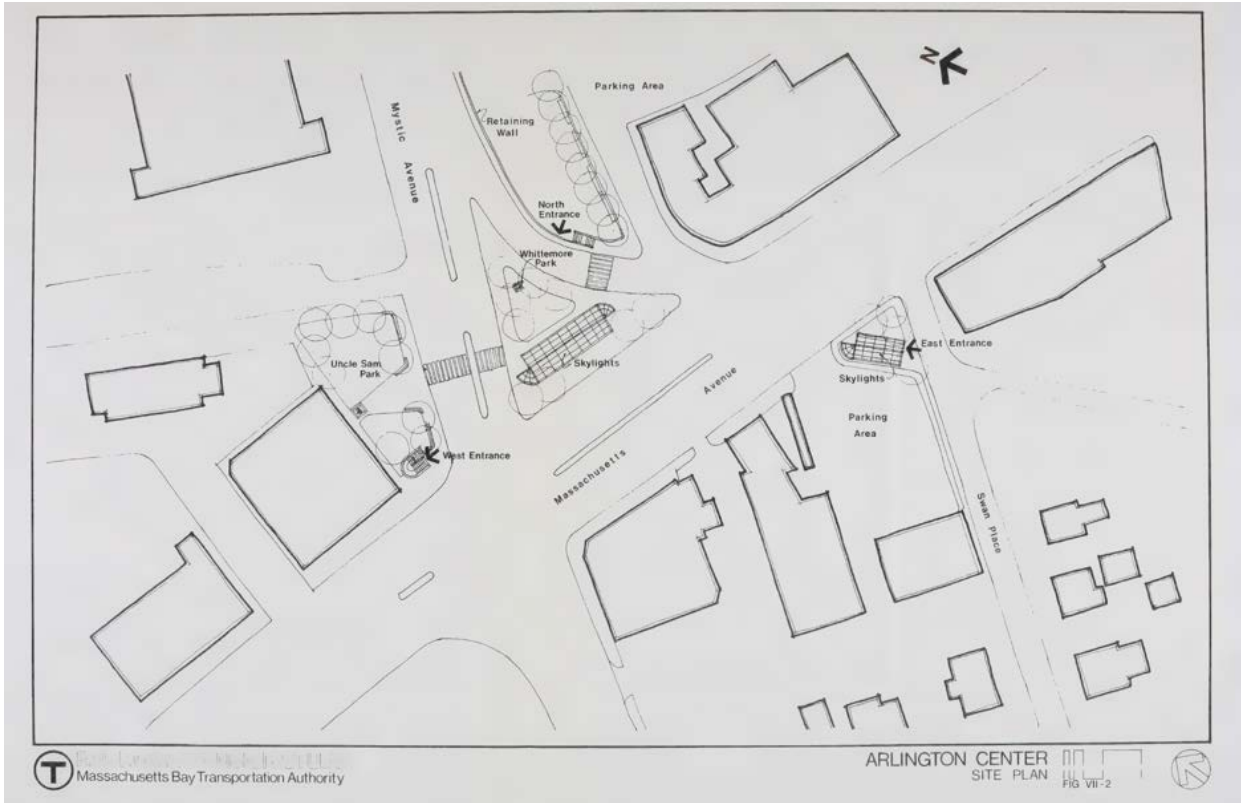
Arlington Center station site plan. Source: EIS VII
